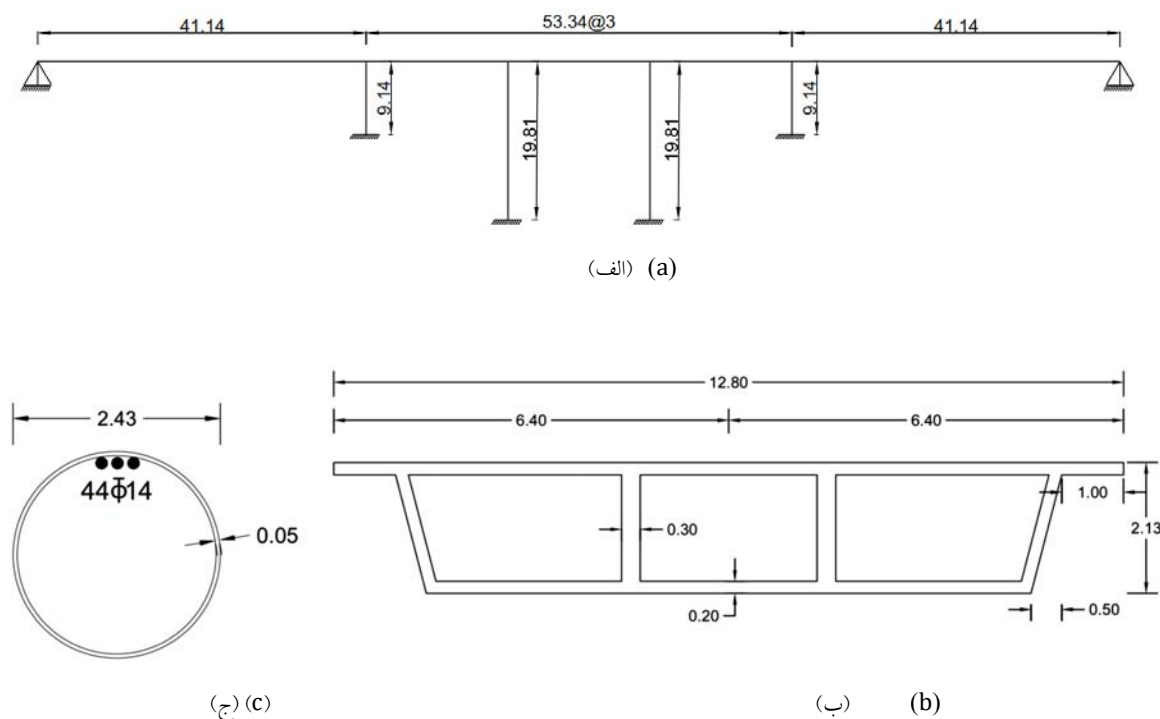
Specification of TY0H-1 Bridge (a) longitudinal section (b) cross section of the deck and (c) cross section of the pier (Dimension in meters)
